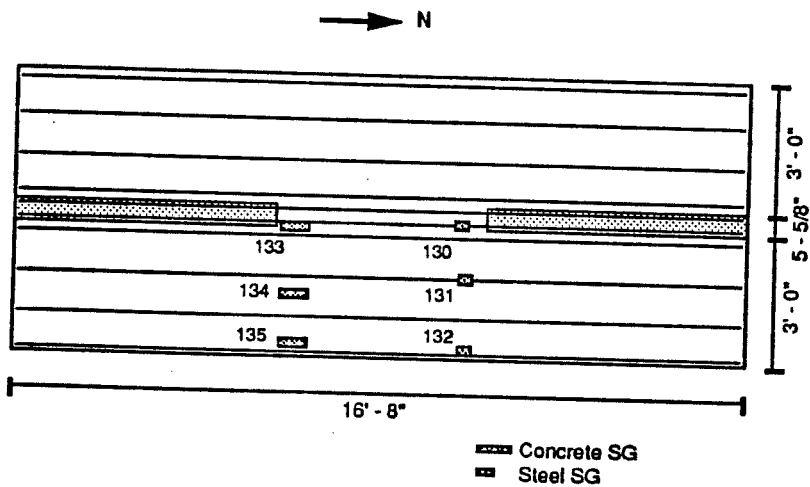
Specimen 2a: Strain Gauges for Second Story Slab
